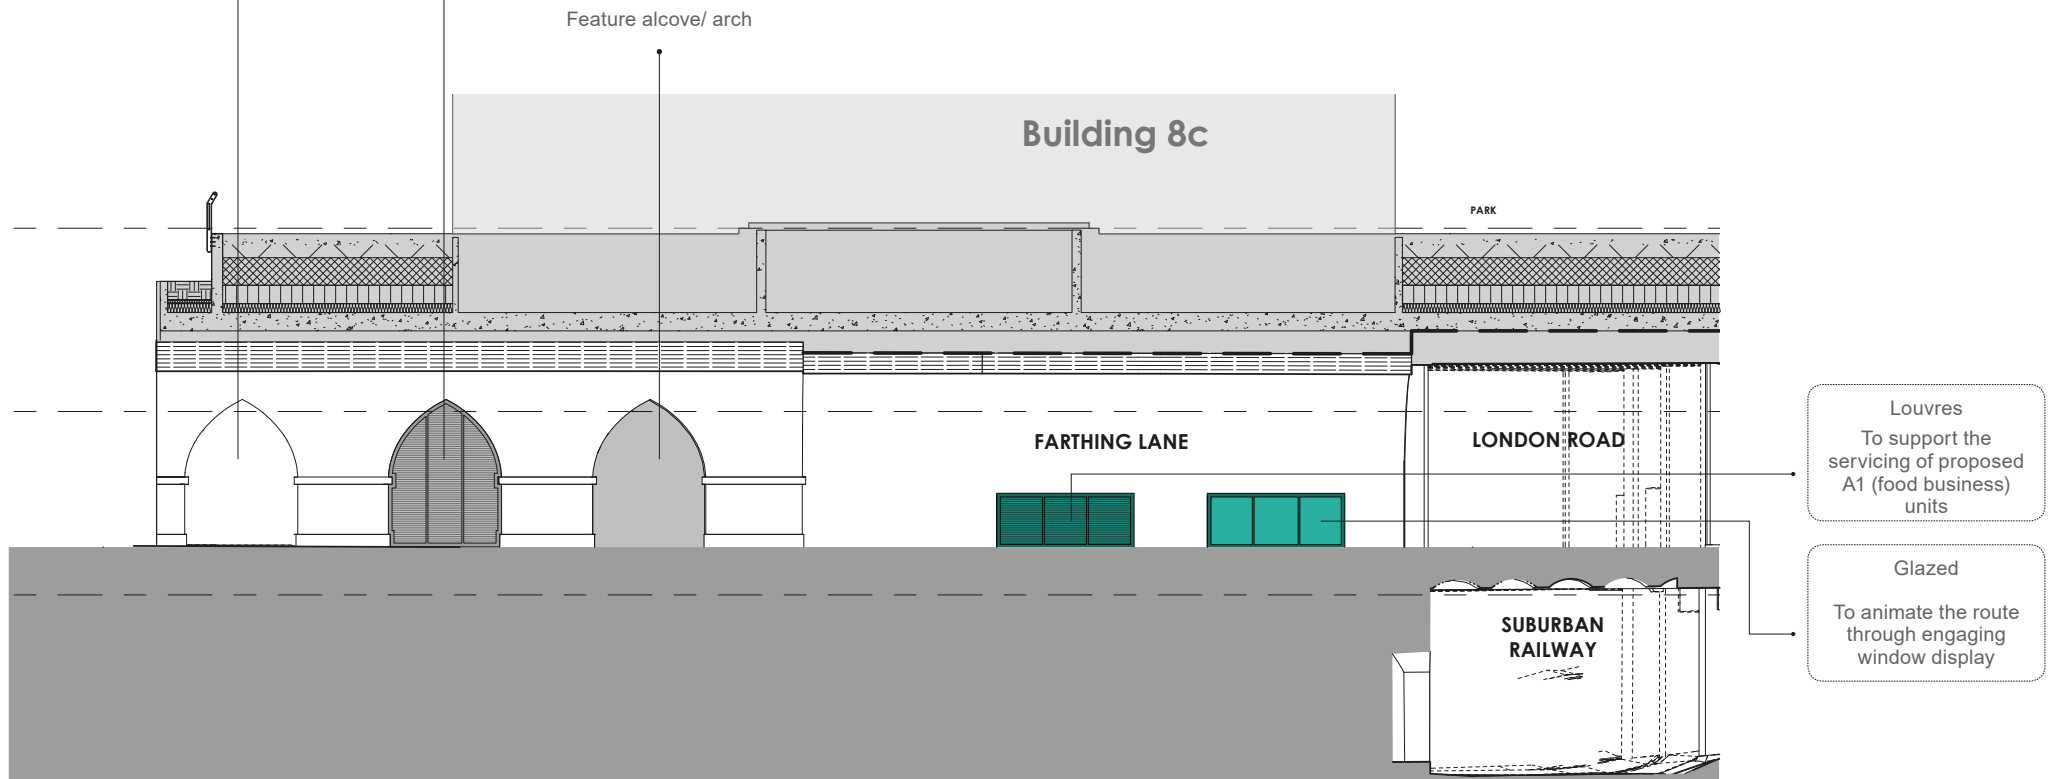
Proposed new openings - Farthing Lane elevation
